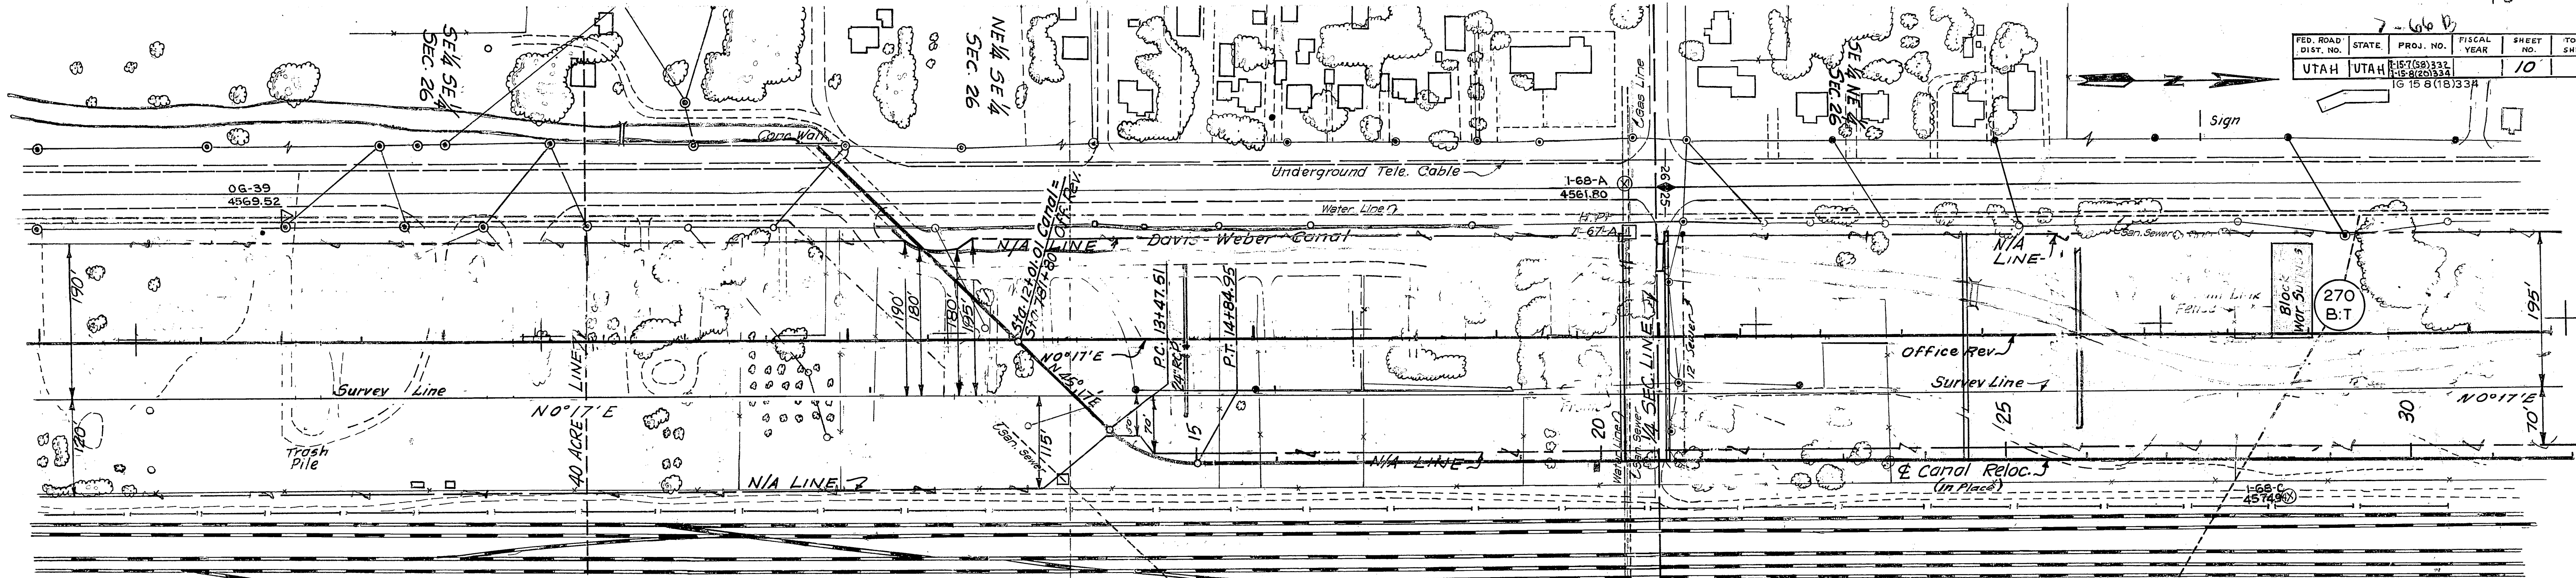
PLATE I - PLAN-PROFILE B. P. R. STANDARD
